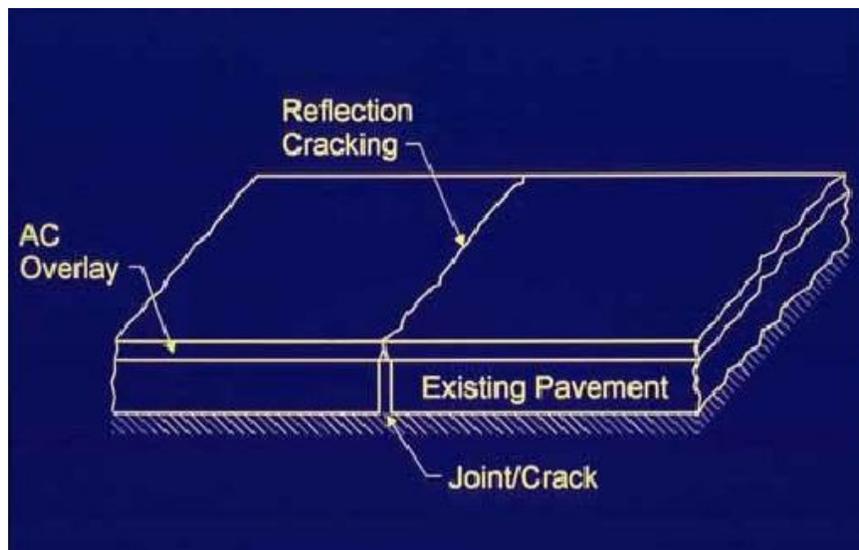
A reflective crack propagates from the existing concrete pavement into the new asphalt overlay (from Ceylan et al. 2005).
